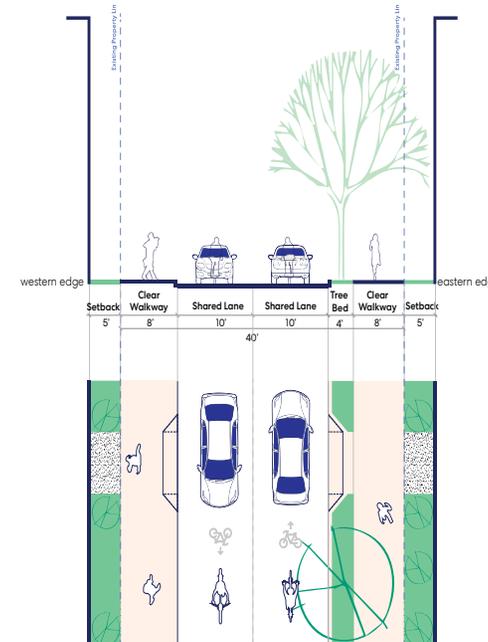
Typical Ash Street section between Page Mill Road and Olive Avenue
